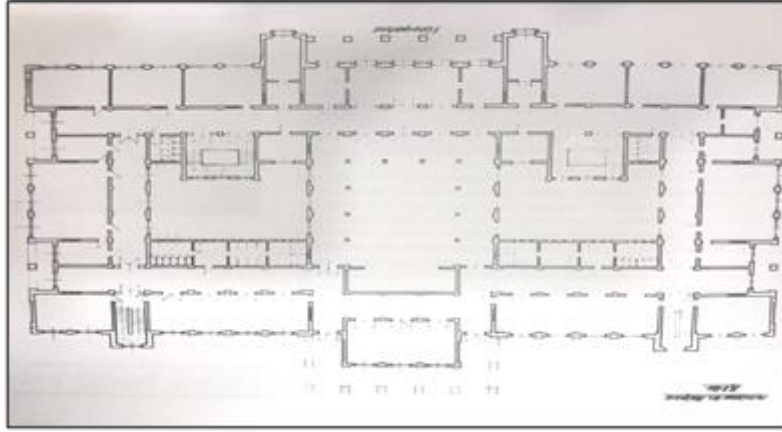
Gazi Education Institute, First Floor Plan, (Yavuz, Y, *Empire to Republic Architect Kemalettin 1870-1927*, Source: GEEA)
